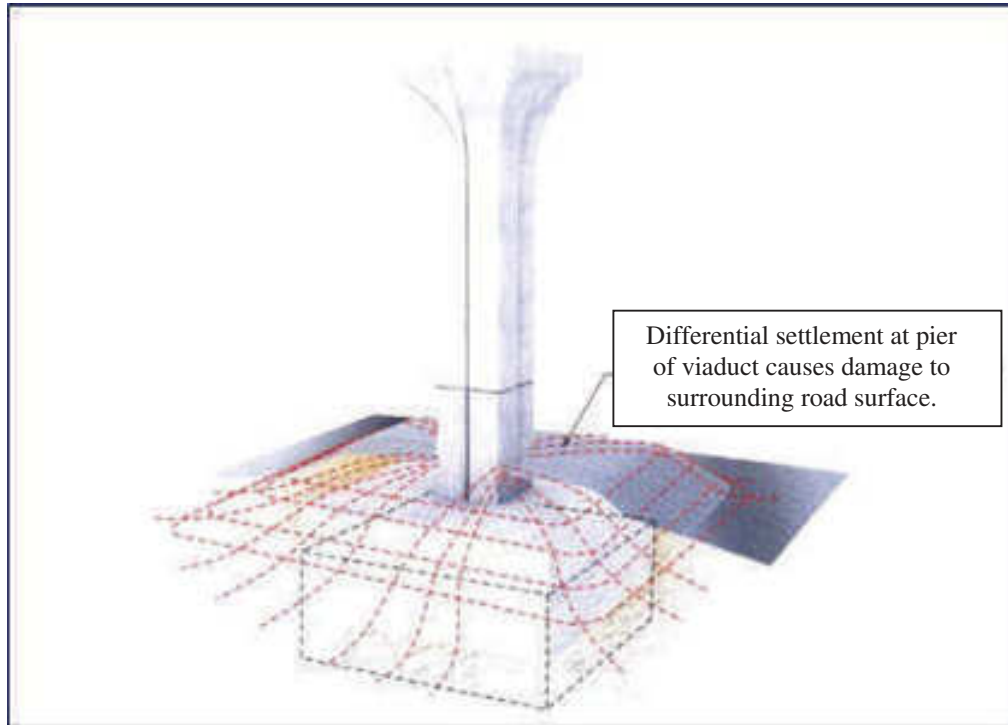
Impact from Differential Settlement at Pier of Viaduct and Road
